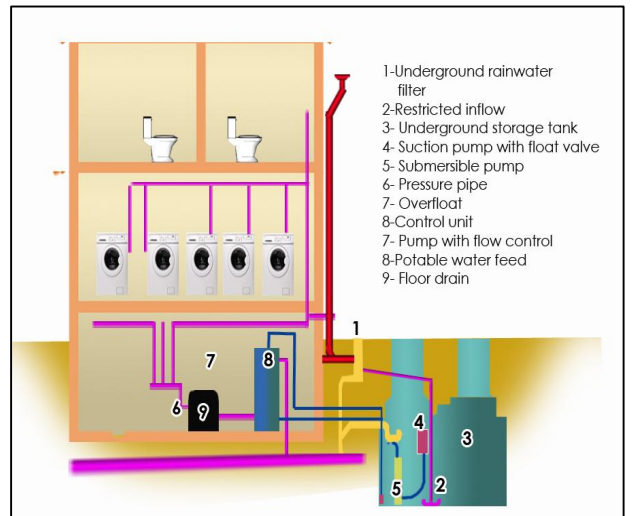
Typical Underground Storage Tank with Submersible Pump and Pump in the Basement.
